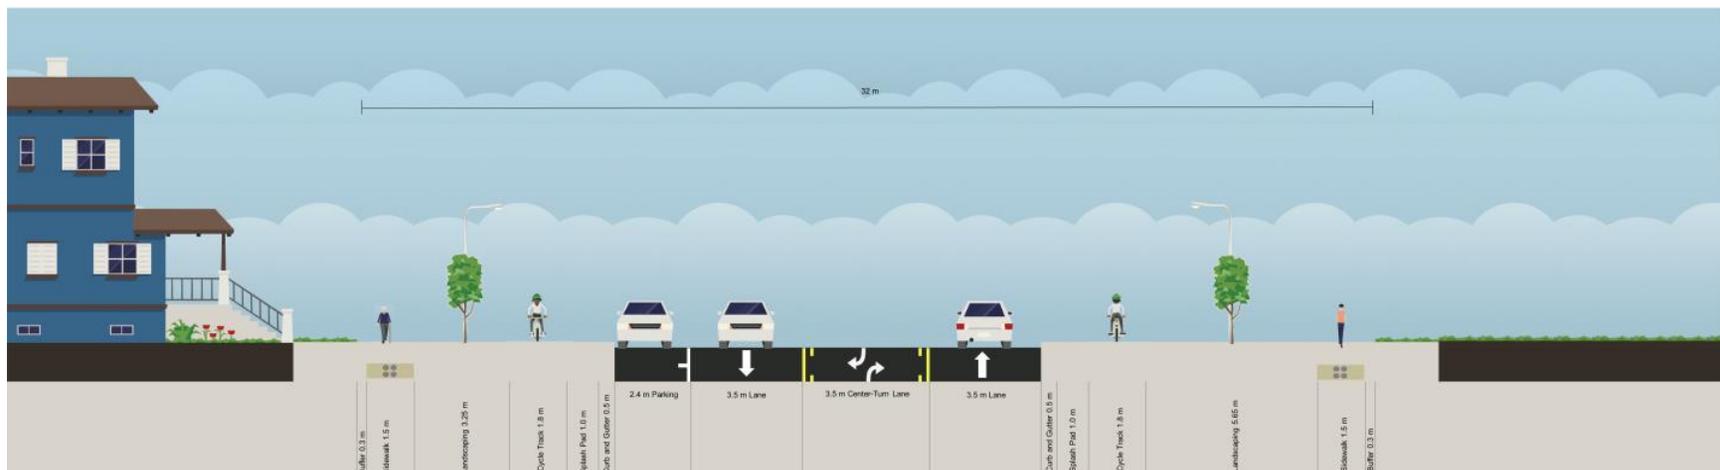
Area 5 Preferred Typical Cross-Section
